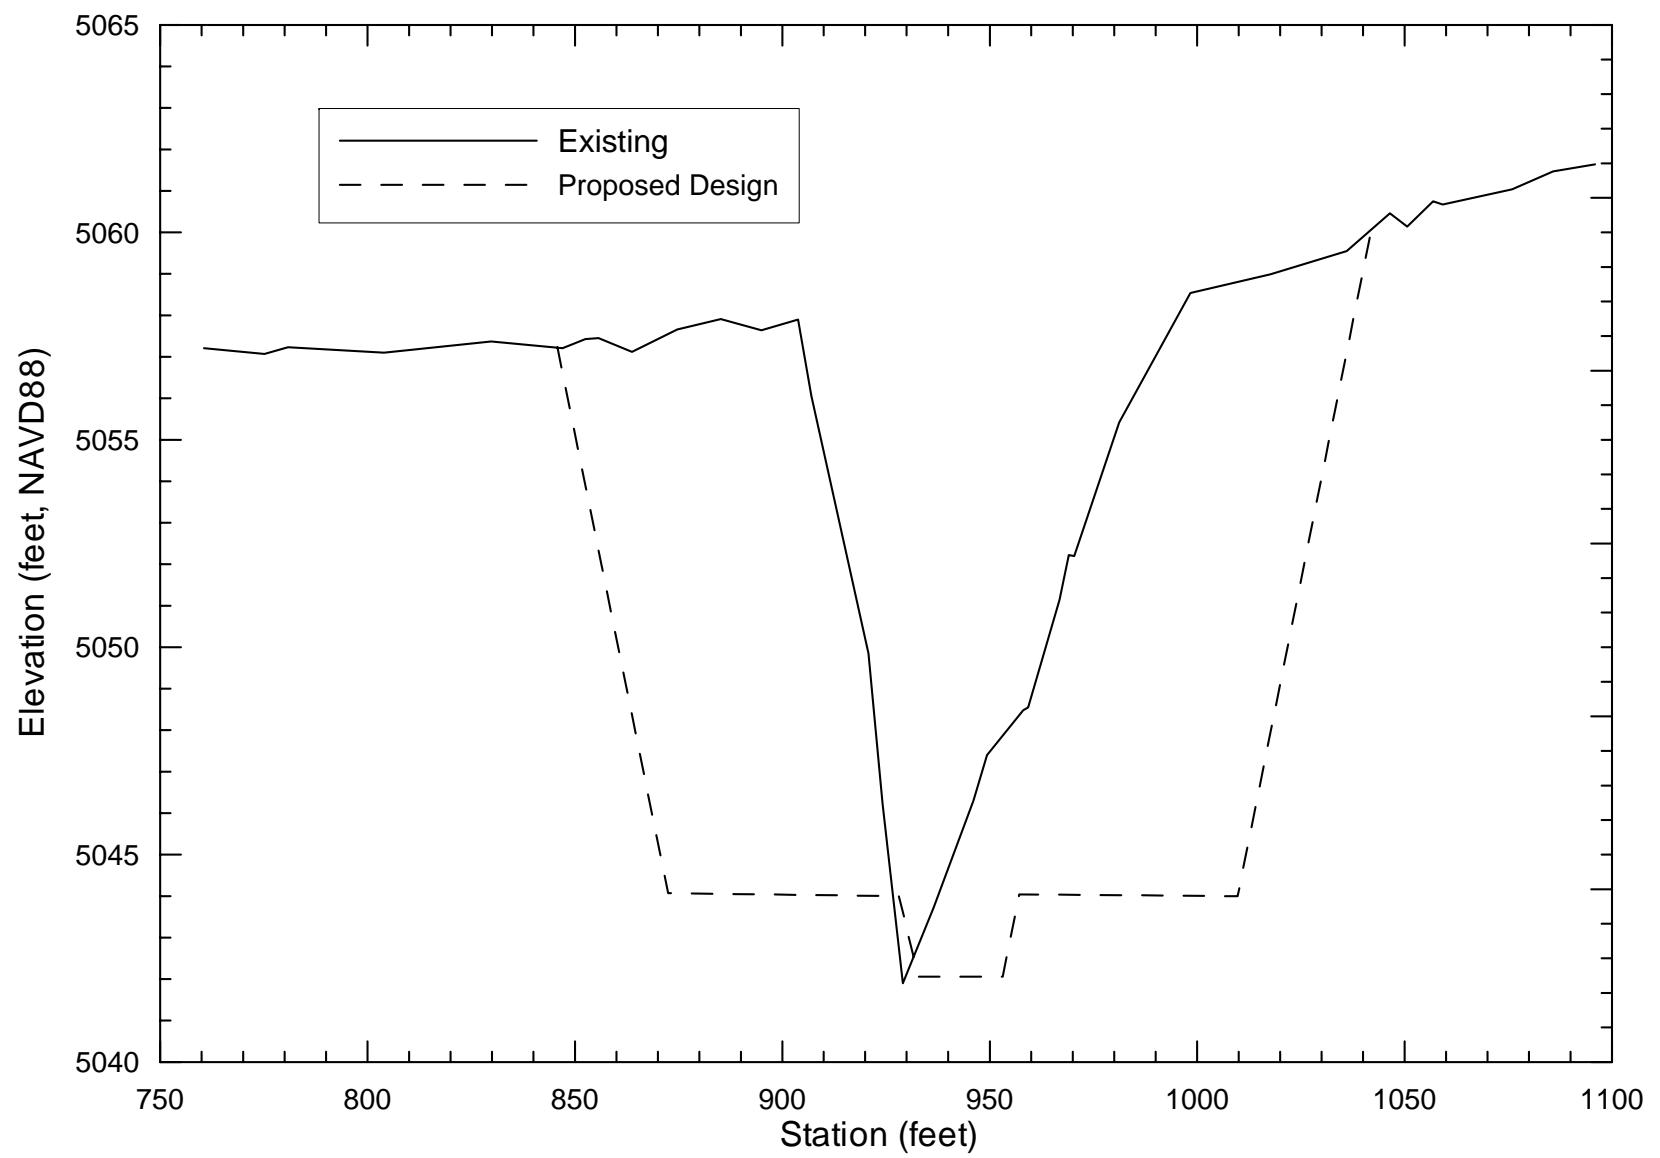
Proposed widening of Tijeras Arroyo at the proposed University Boulevard bridge crossing.
